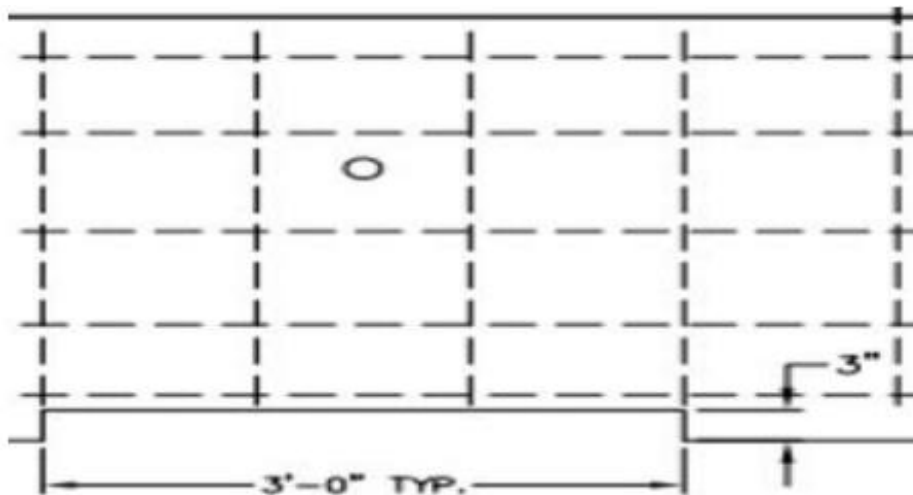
Elevation view of vertical reinforcement in region 1 spaced at 12 in.
